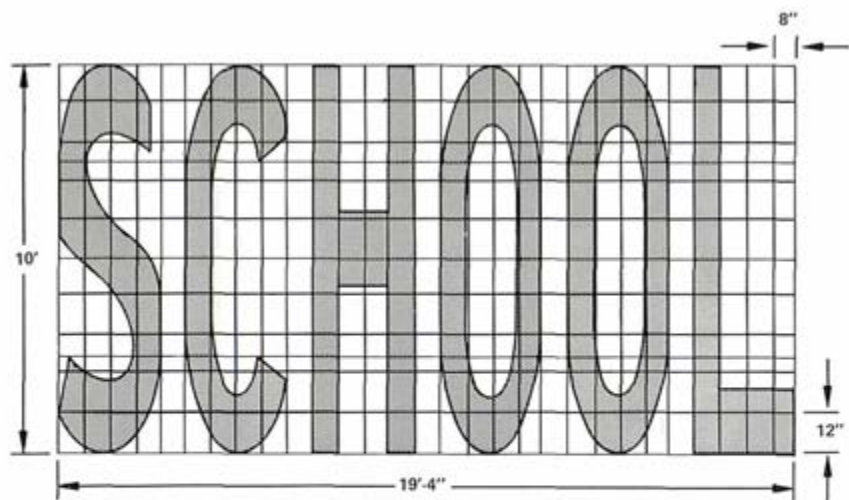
Two-lane pavement marking—detail of word "SCHOOL".
